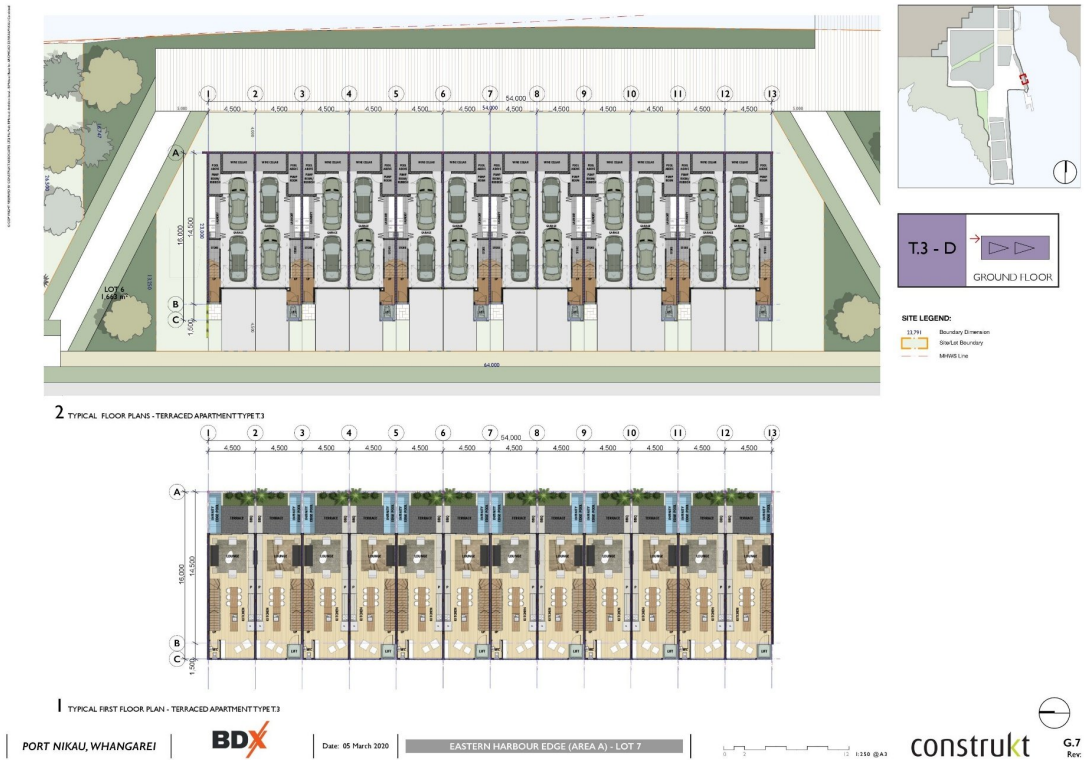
Part G – Eastern Harbour Edge (Area A) Floor Plans
